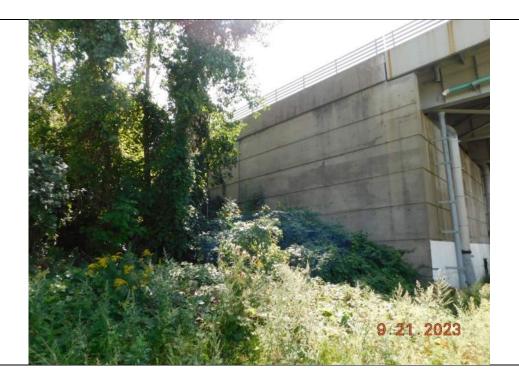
[South Abutment] -Abutment East wingwall, Looking Southwest
